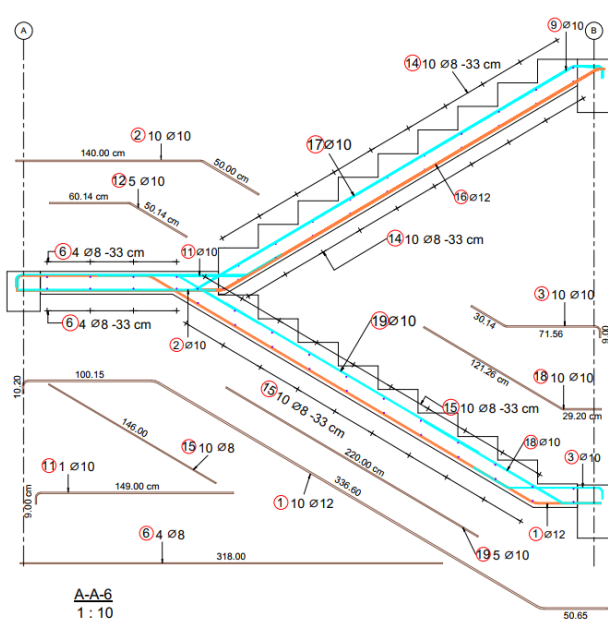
64. Longitudinal cross-section of the staircase at section A-6
